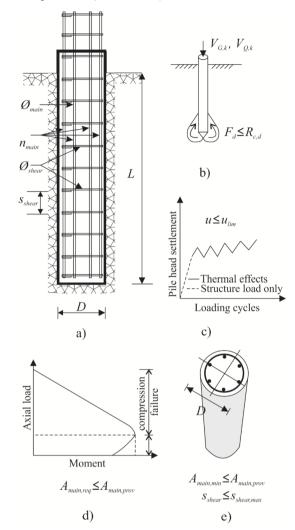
Geothermal energy pile: Cross-section of pile (a), pile design resistance (b), pile settlement under thermal effects (c), interaction diagrams (d) and steel reinforcement design (e) ^[21].
